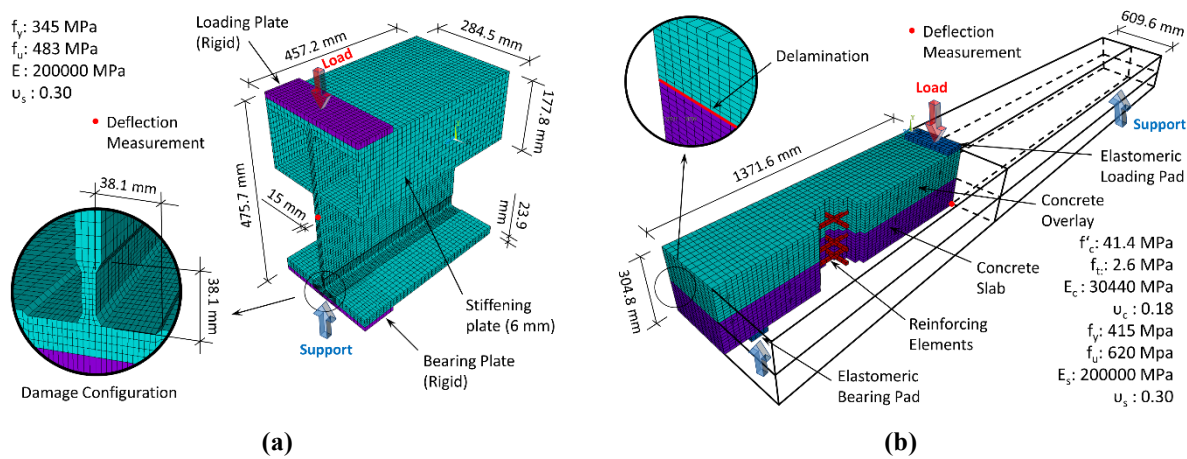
Damaged element-level FE model development (a) end deterioration in steel girder (b) delamination in reinforced concrete slab
